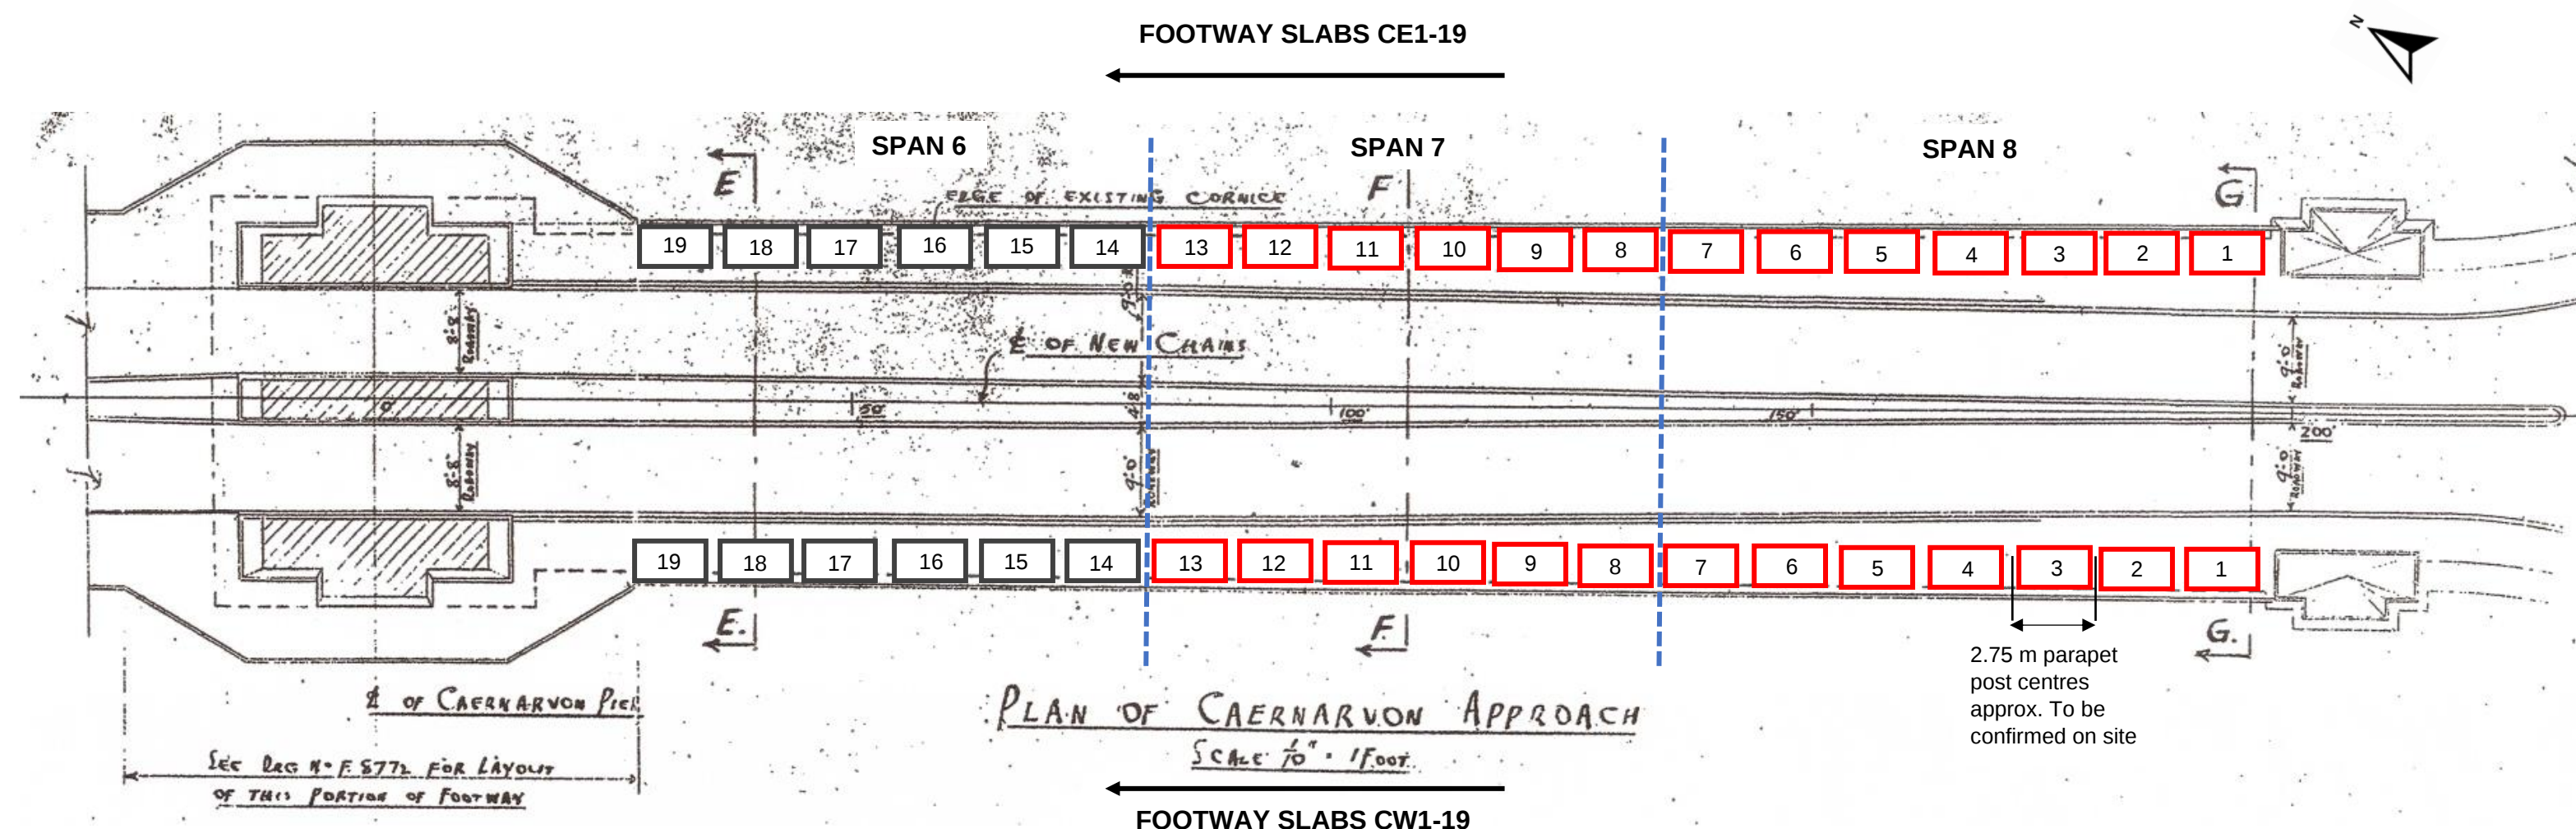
Plan of Caernarvon Approach highlighting footway panels and spans
